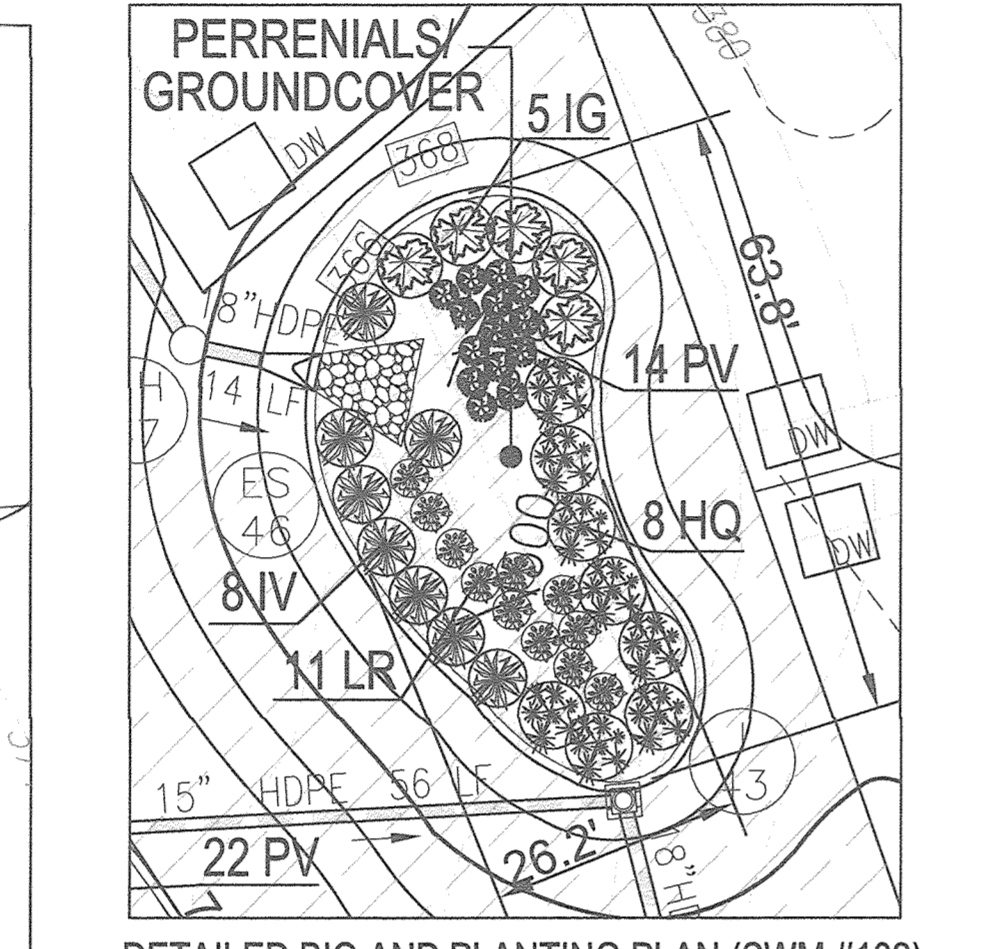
DETAILED BIO AND PLANTING PLAN (SWM #60)
